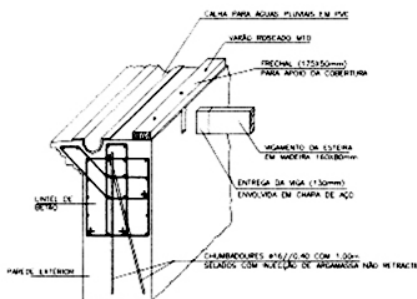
Reinforcement of the connections between roof and masonry walls by a concrete beam (Appleton and Em
